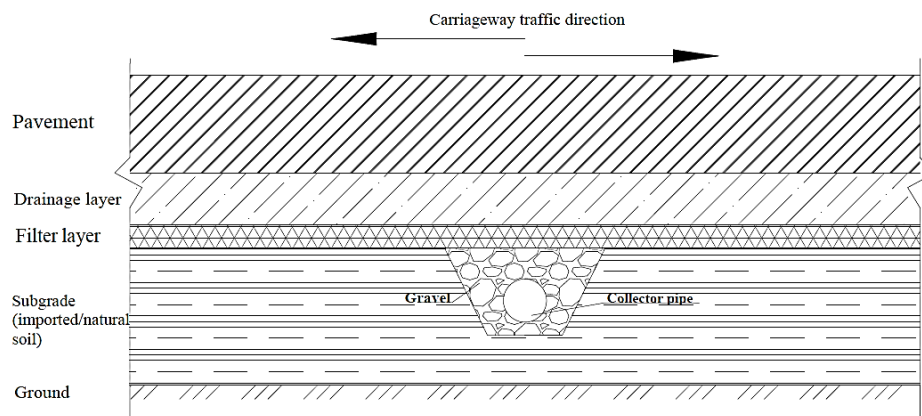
Perforated collector pipes as transverse drains in the foundation (Dawson, 2008)
